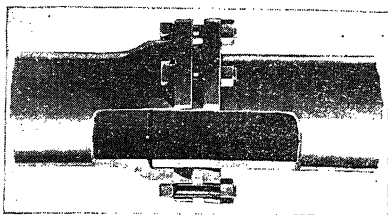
Mechanical (gland-type) joint for cast-iron pipe.
